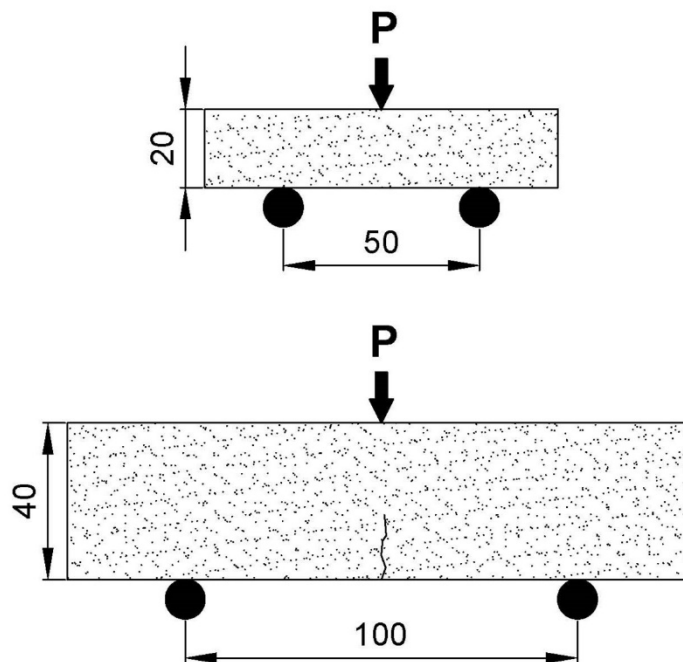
Schematic drawing of the 3-point bending tests, in mm [9]
